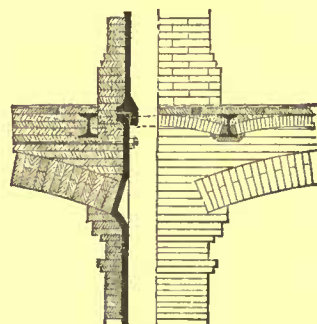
Cast-iron column protected by 4½ ins. of brick. Instead of girders, brick arches are sprung between columns for supporting the floors.
